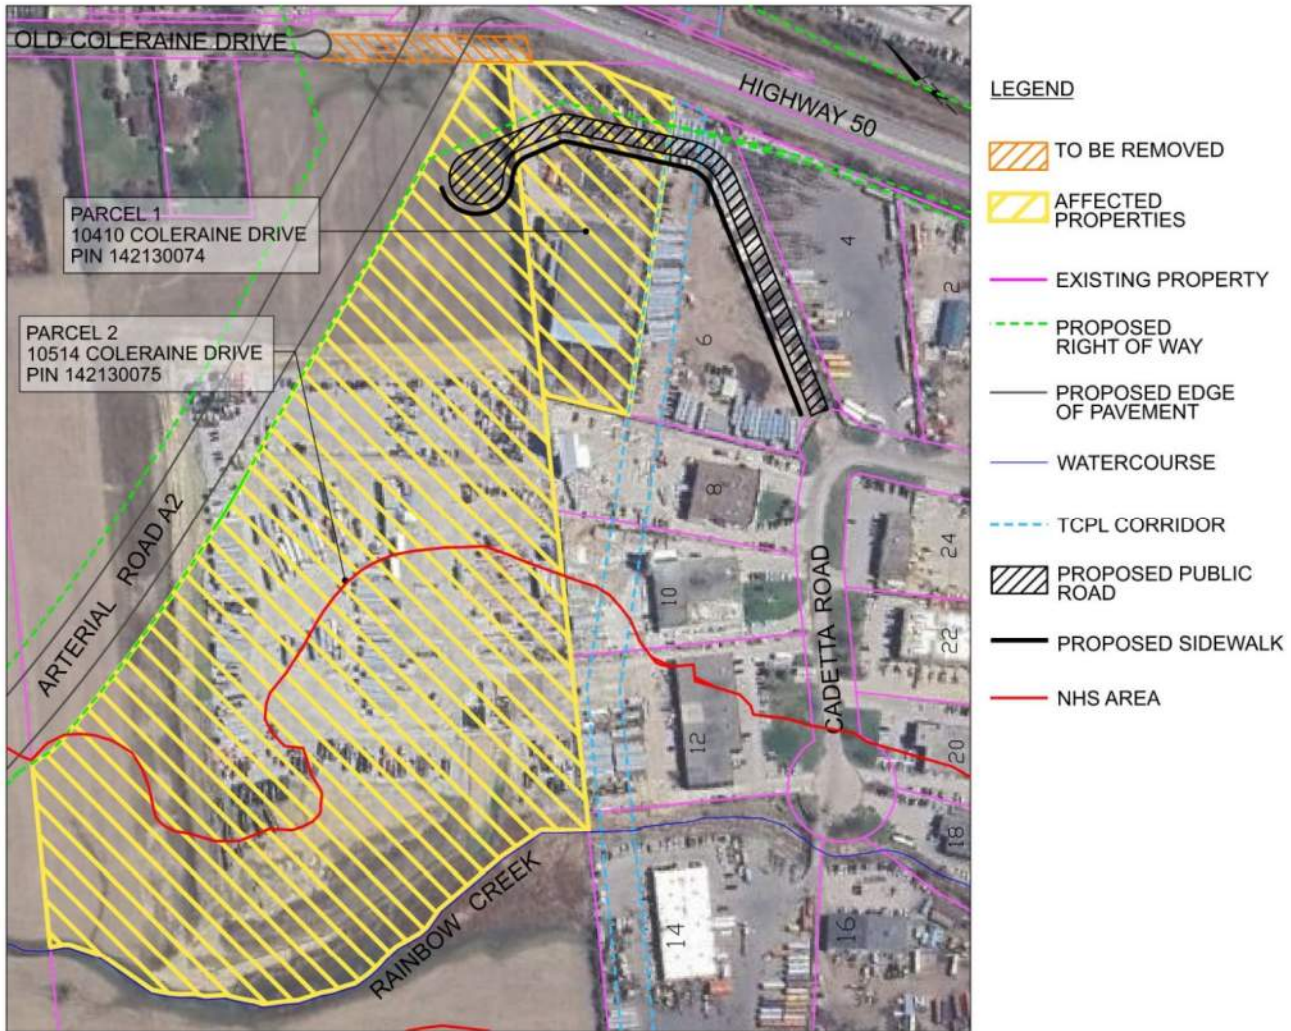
Options 6A & 6B Extension of Road Access at ‘Elbow’ of Cadetta Road
